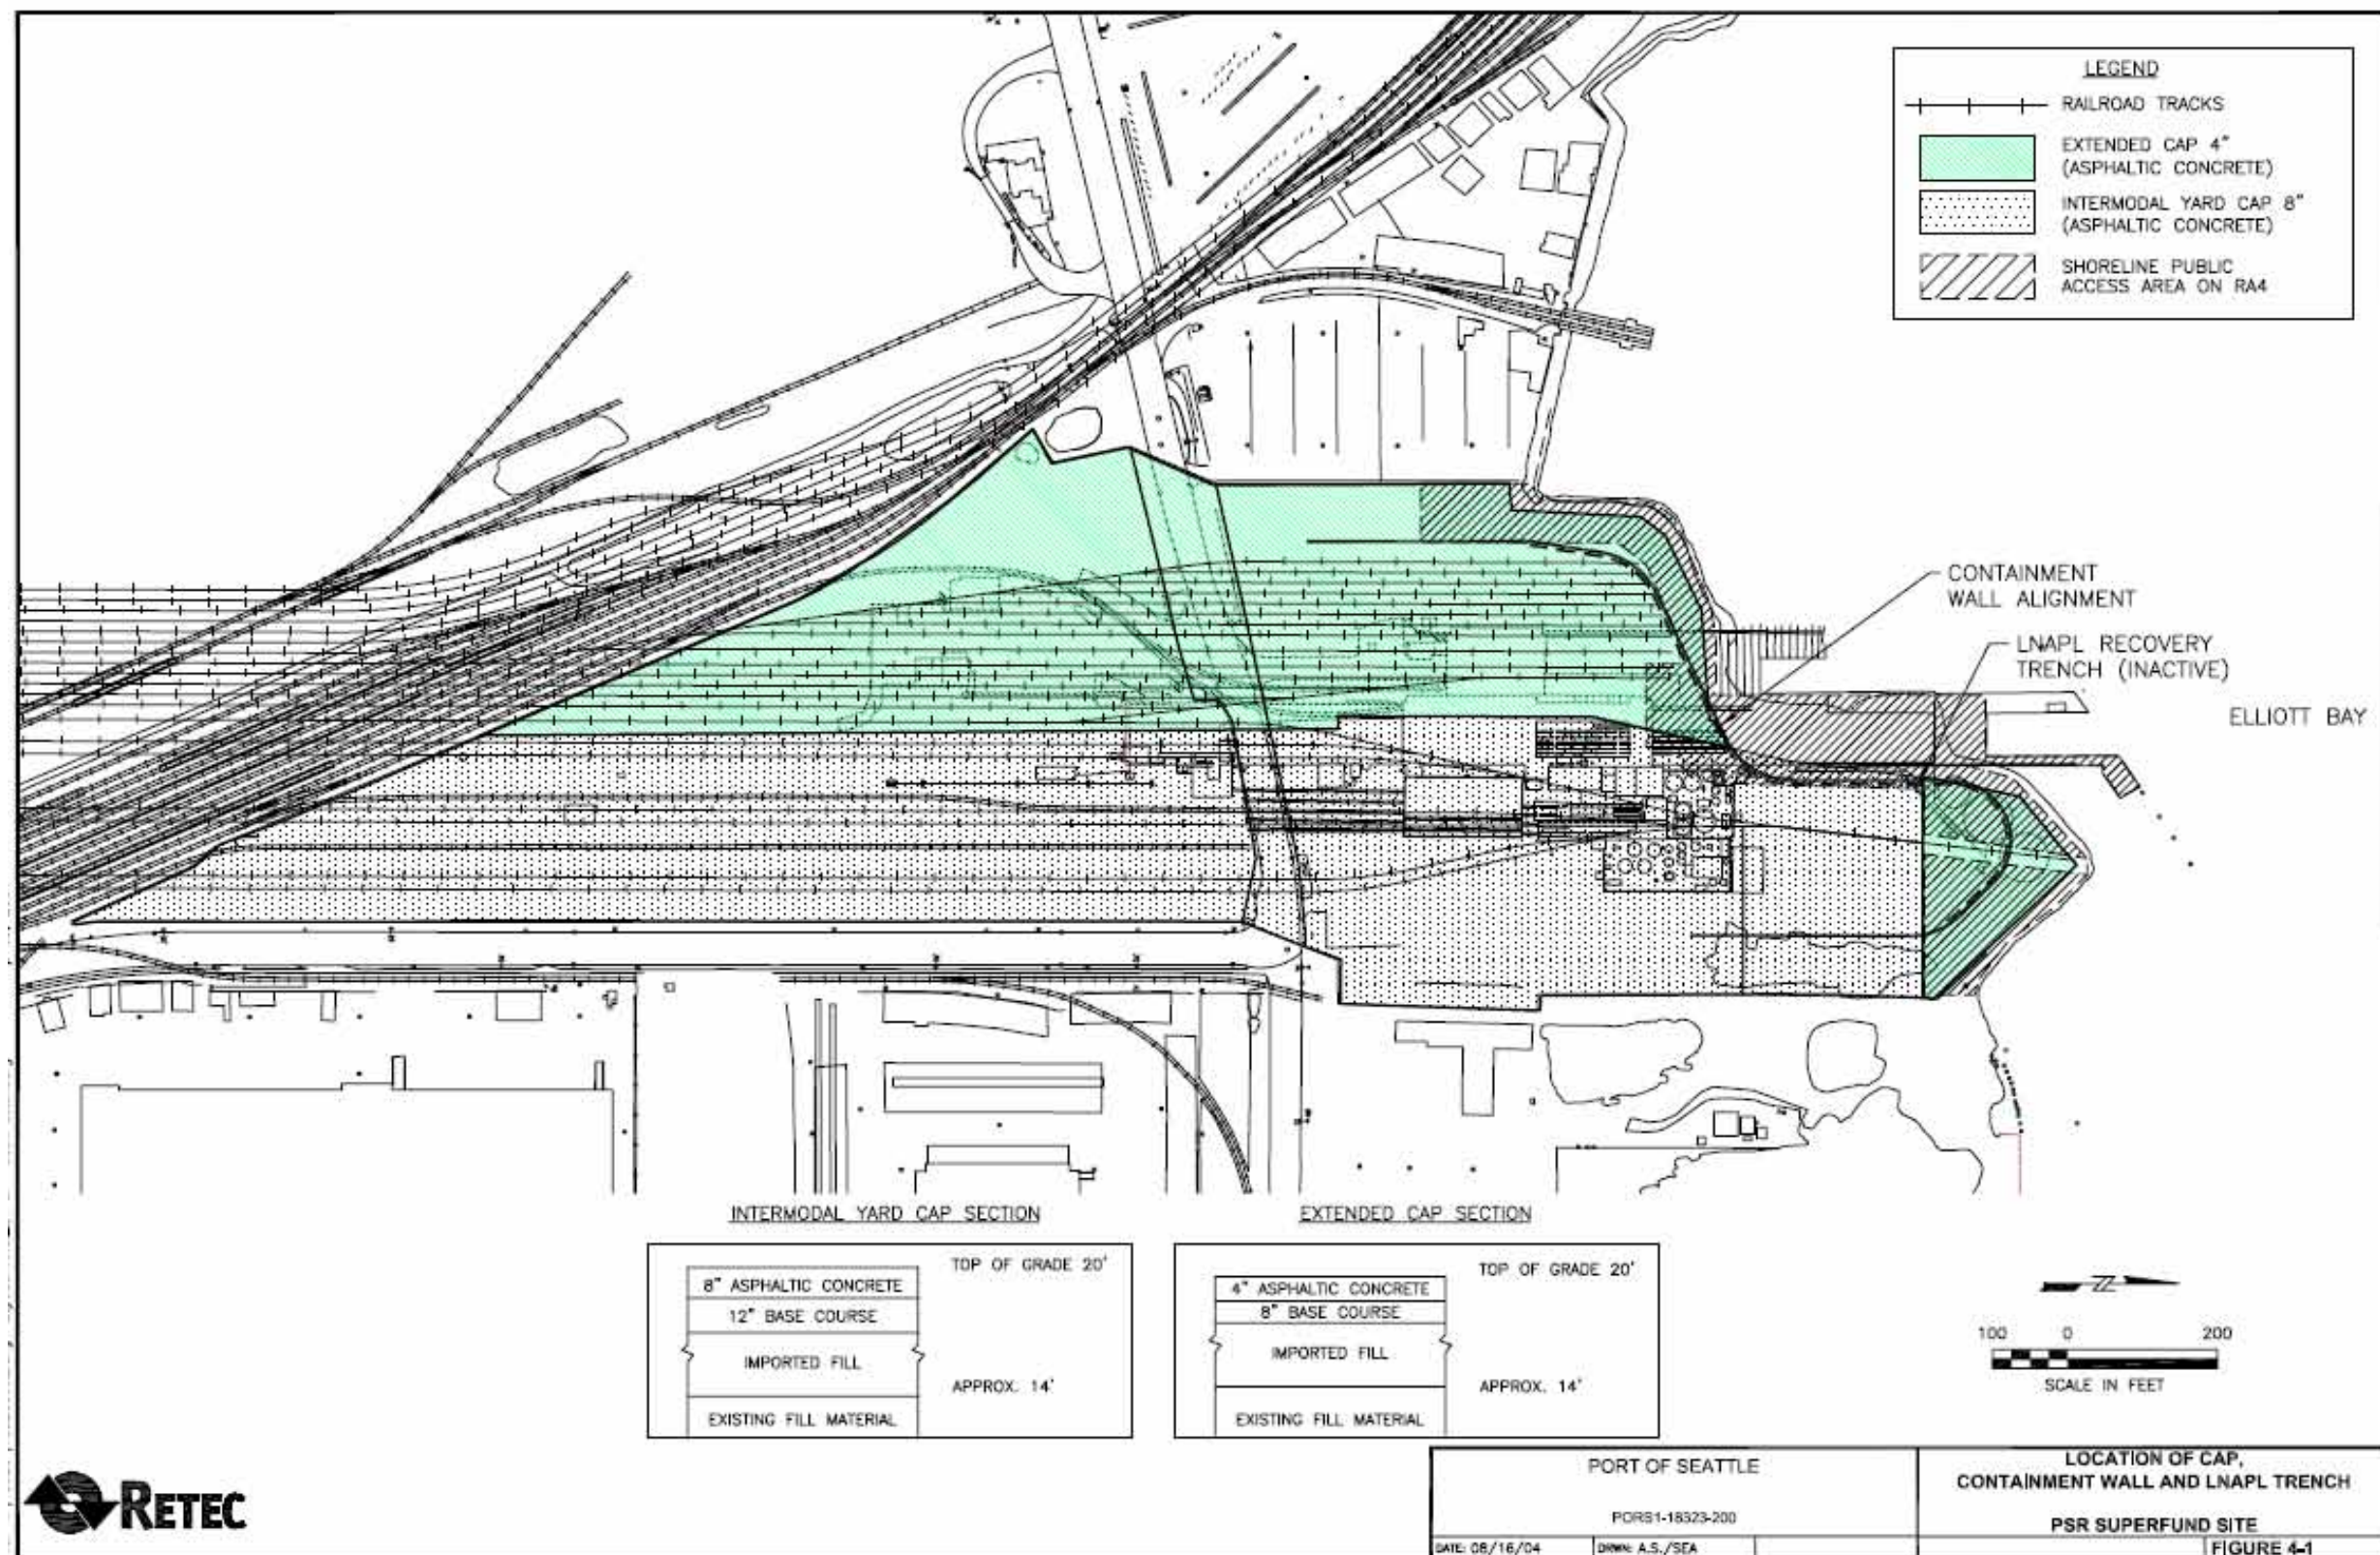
Location of the cap, slurry wall and LNAPL collection trench. Note that site features such as old tank farm and buildings indicated on this drawing no longer exist on site.
